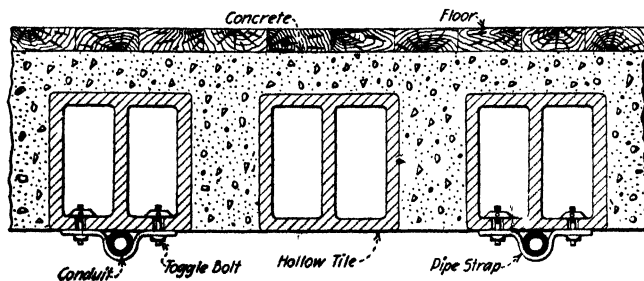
Conduit held to hollow tile with toggle bolts.
